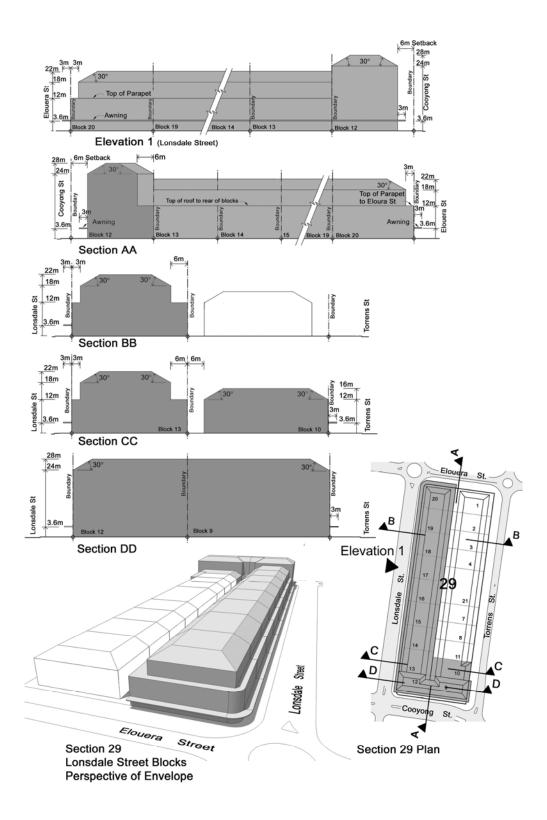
Building Envelope Diagram - Braddon Section 29 blocks 9, 10, 12 – 20 (CZ3 Zone)
